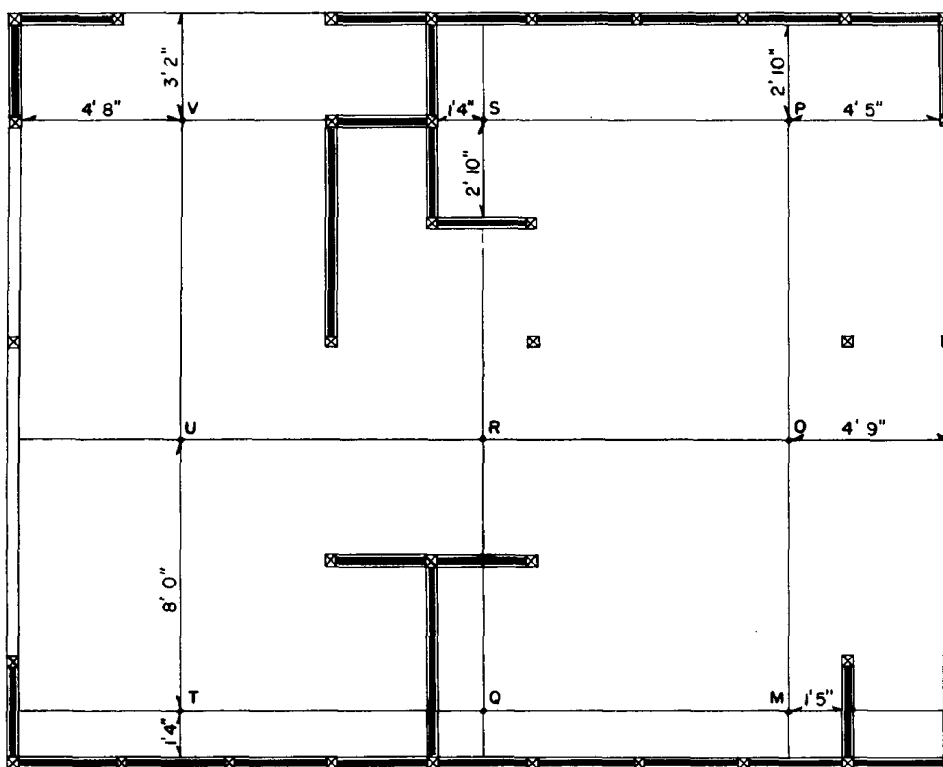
Second-floor plan of type B Japanese-house facsimile.
